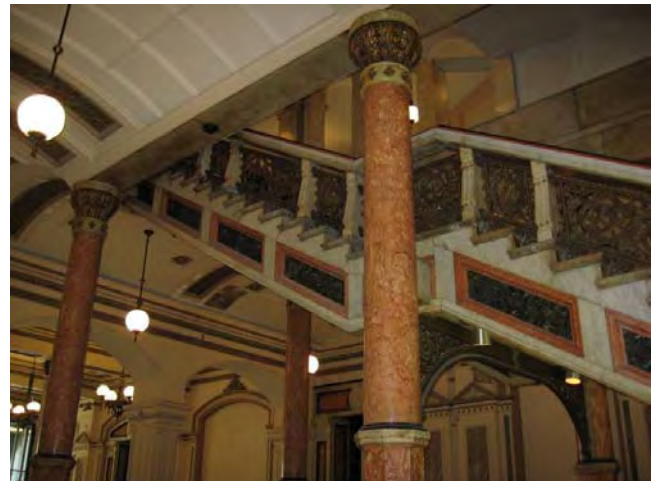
Cast iron columns supporting the grand staircase of the second floor.
